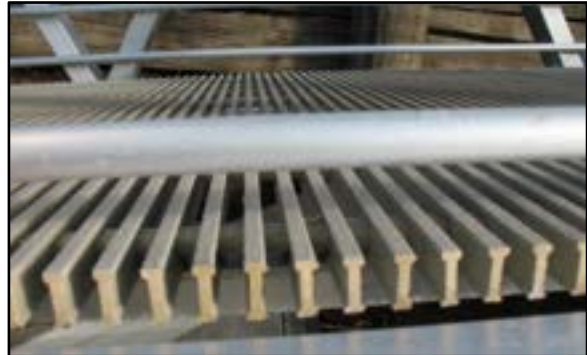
Pultruded fiberglass decking. Bar gaps are less than 1/2" for ADA compliance.
